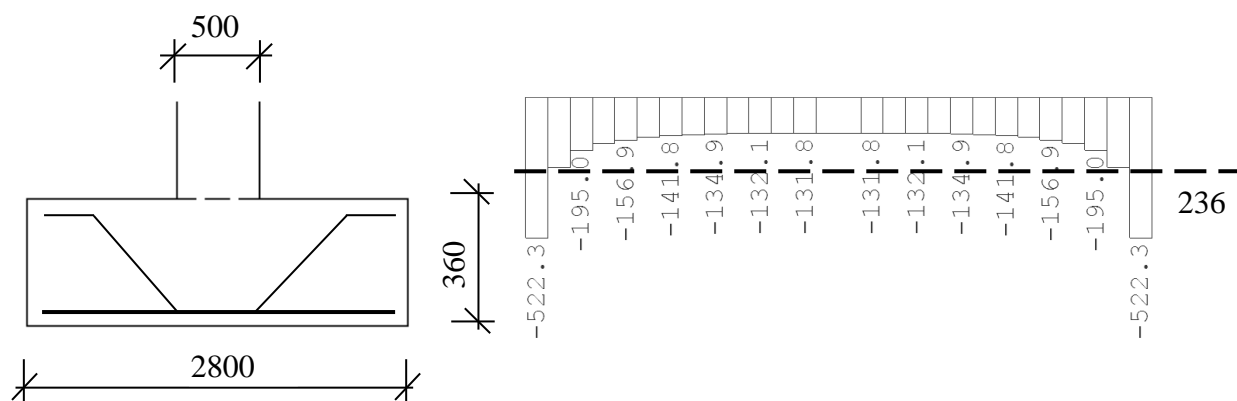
Footing with shear reinforcement (left), ground stress [kPa] (right) – Subsoil 1.
